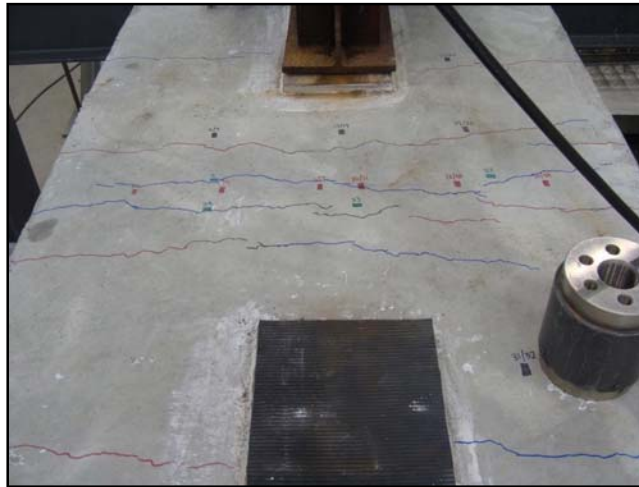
Cracks on subassembly longitudinal splice deck specimen
